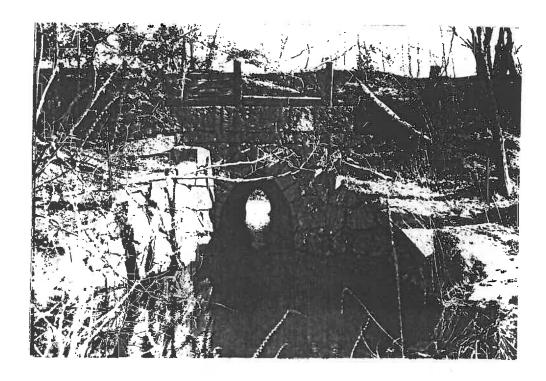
description: Gothic arch culvert, Mill Pond, Seabrook (42.04)
